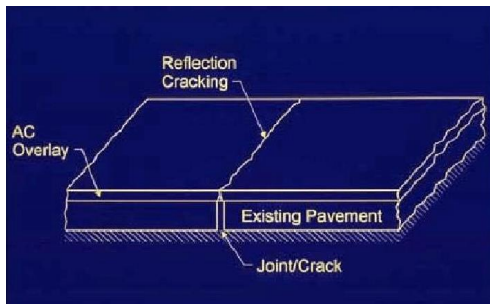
Propagation of reflective crack from the existing concrete pavement into the new asphalt overlay [7].
